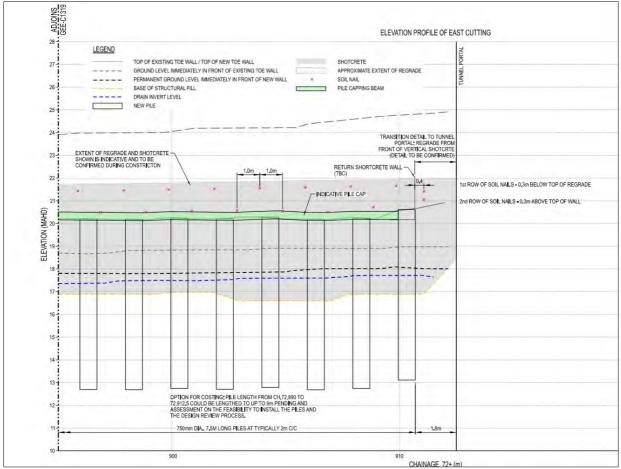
PLAN SHOWING RETAINING WORKS AT UP-END PORTAL. (SOURCE: AURECON/VLINE)
